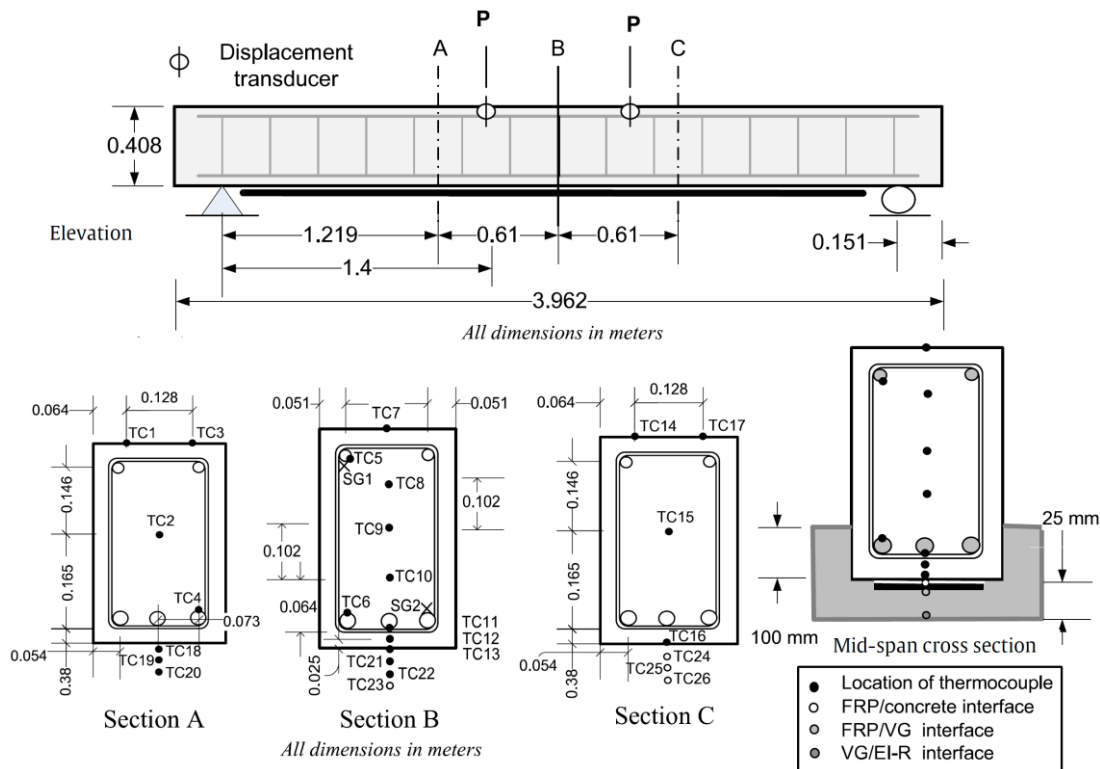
Elevation, cross-sectional details and instrumentation of tested FRP-strengthened RC beam [55]
